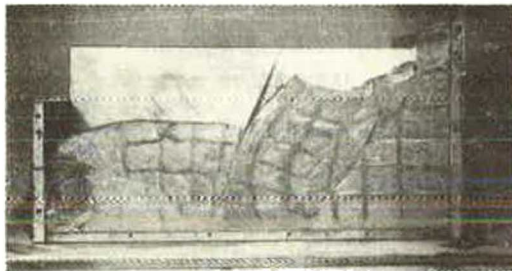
Anchored flexible wall after tie rod failure. (model length 0.65m)
